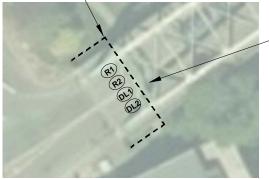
PHOTO SHOWING NORTH-WEST ABUTMENT, APRIL 3, 2018
